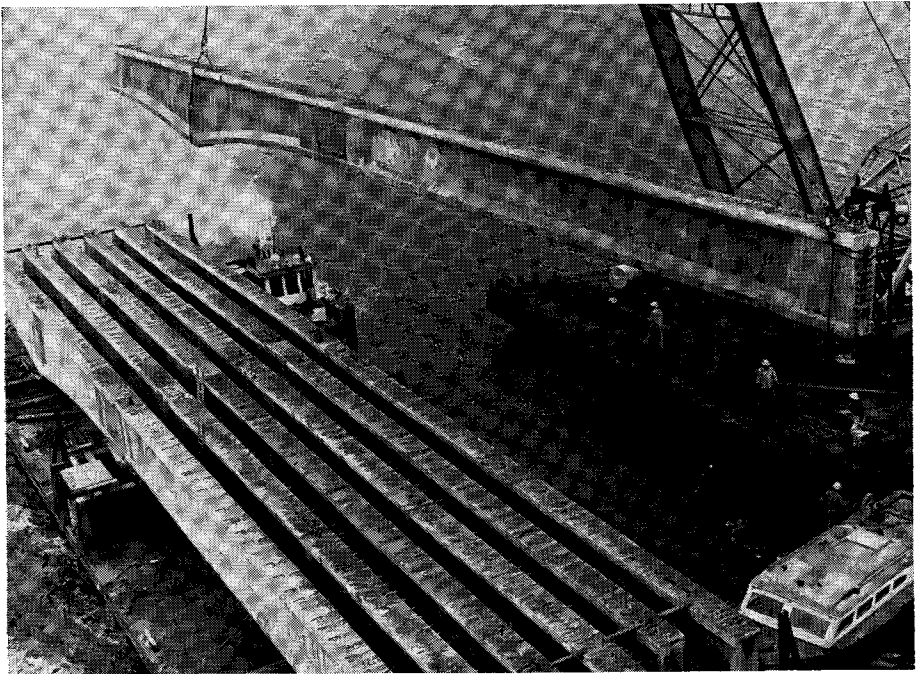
Precast Prestressed Girders for Dupont Bridge after Being Spliced on Barge
